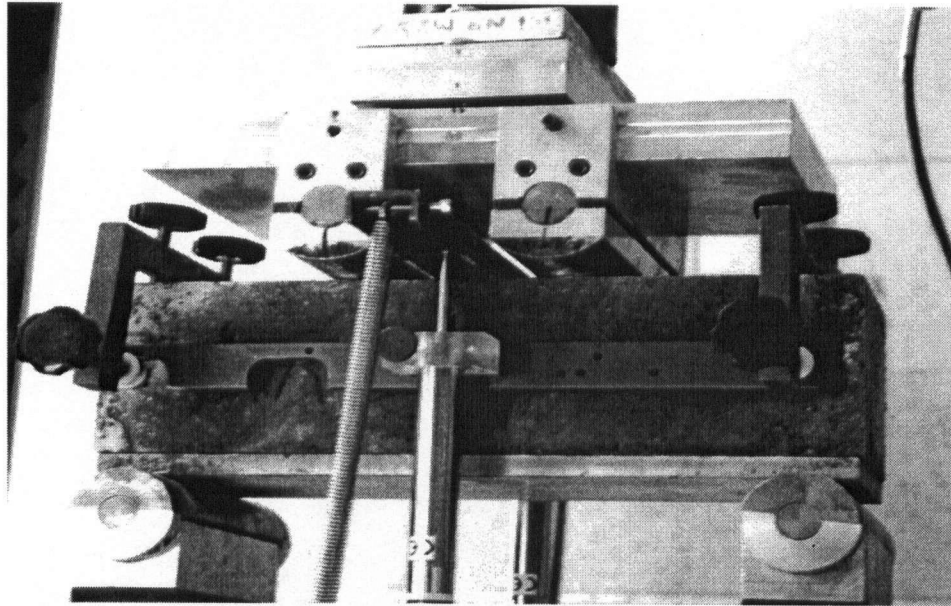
Test on a Fiber Reinforced Concrete Beam using the Residual Strength Test Method. Note the steel plate under the beam.
